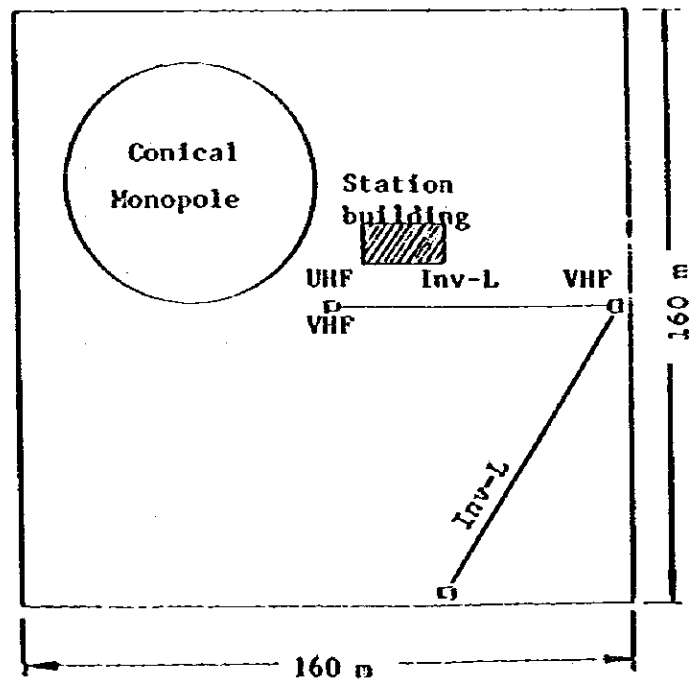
(1) Typical Site Layout for Class A Station
